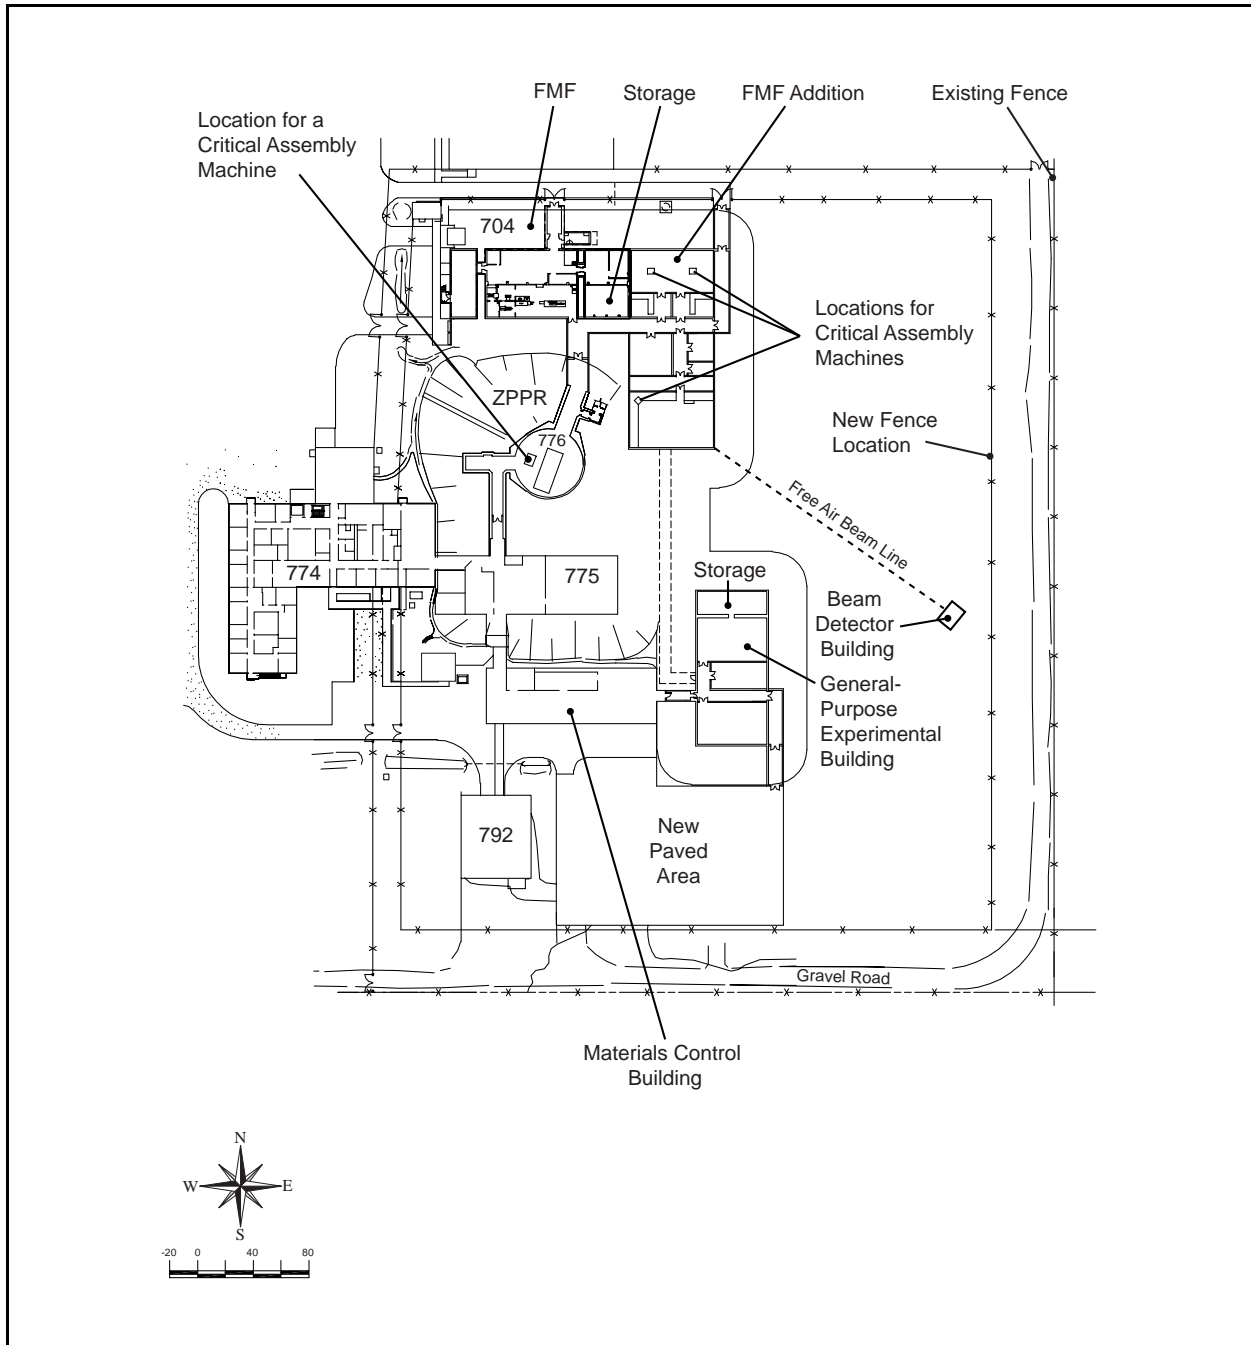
Proposed Relocation Layout (ANL-W Alternative)
